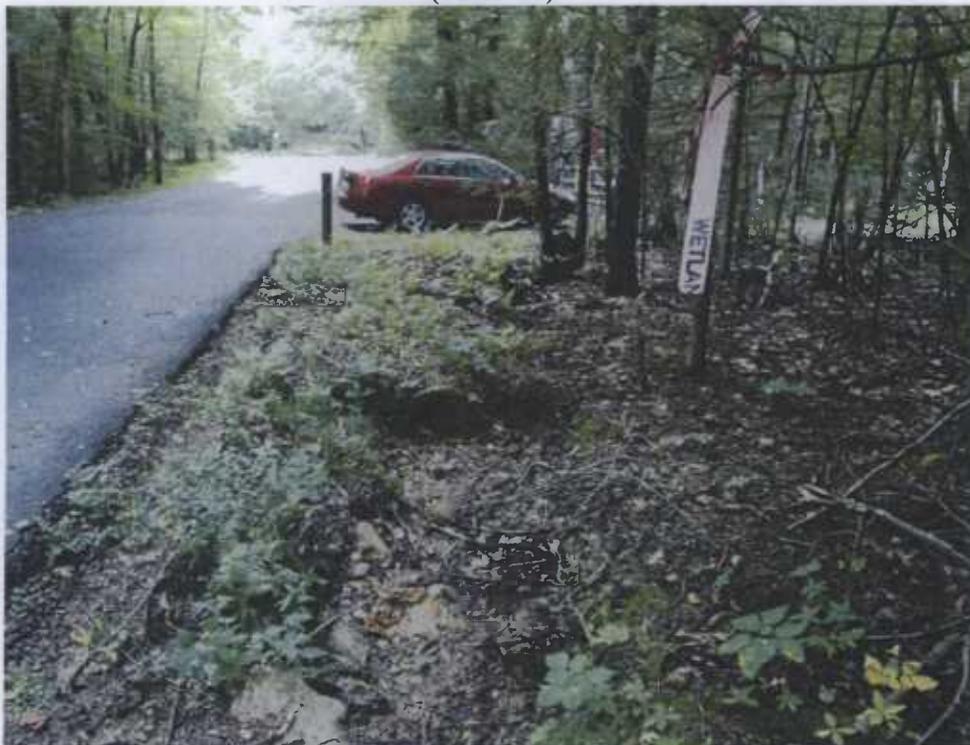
View of Wetland A outlet into drainage channel, looking west at existing gravel drive entrance into hunt club. (08/25/10)
